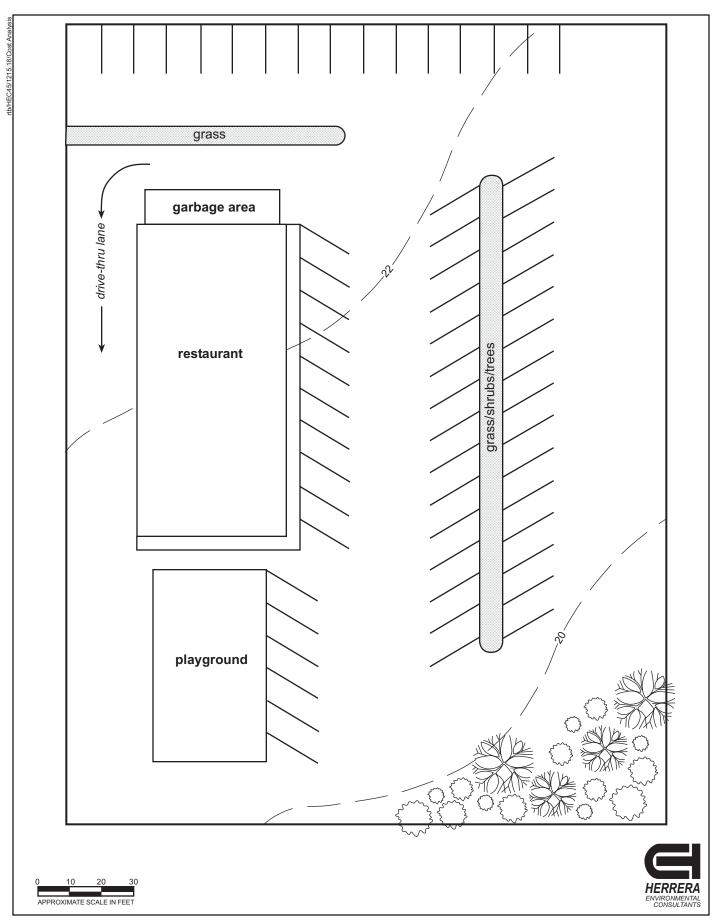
One-acre commerical development plan, without stormwater facilities, superimposed on natural (pre-development) topography and drainage features.
